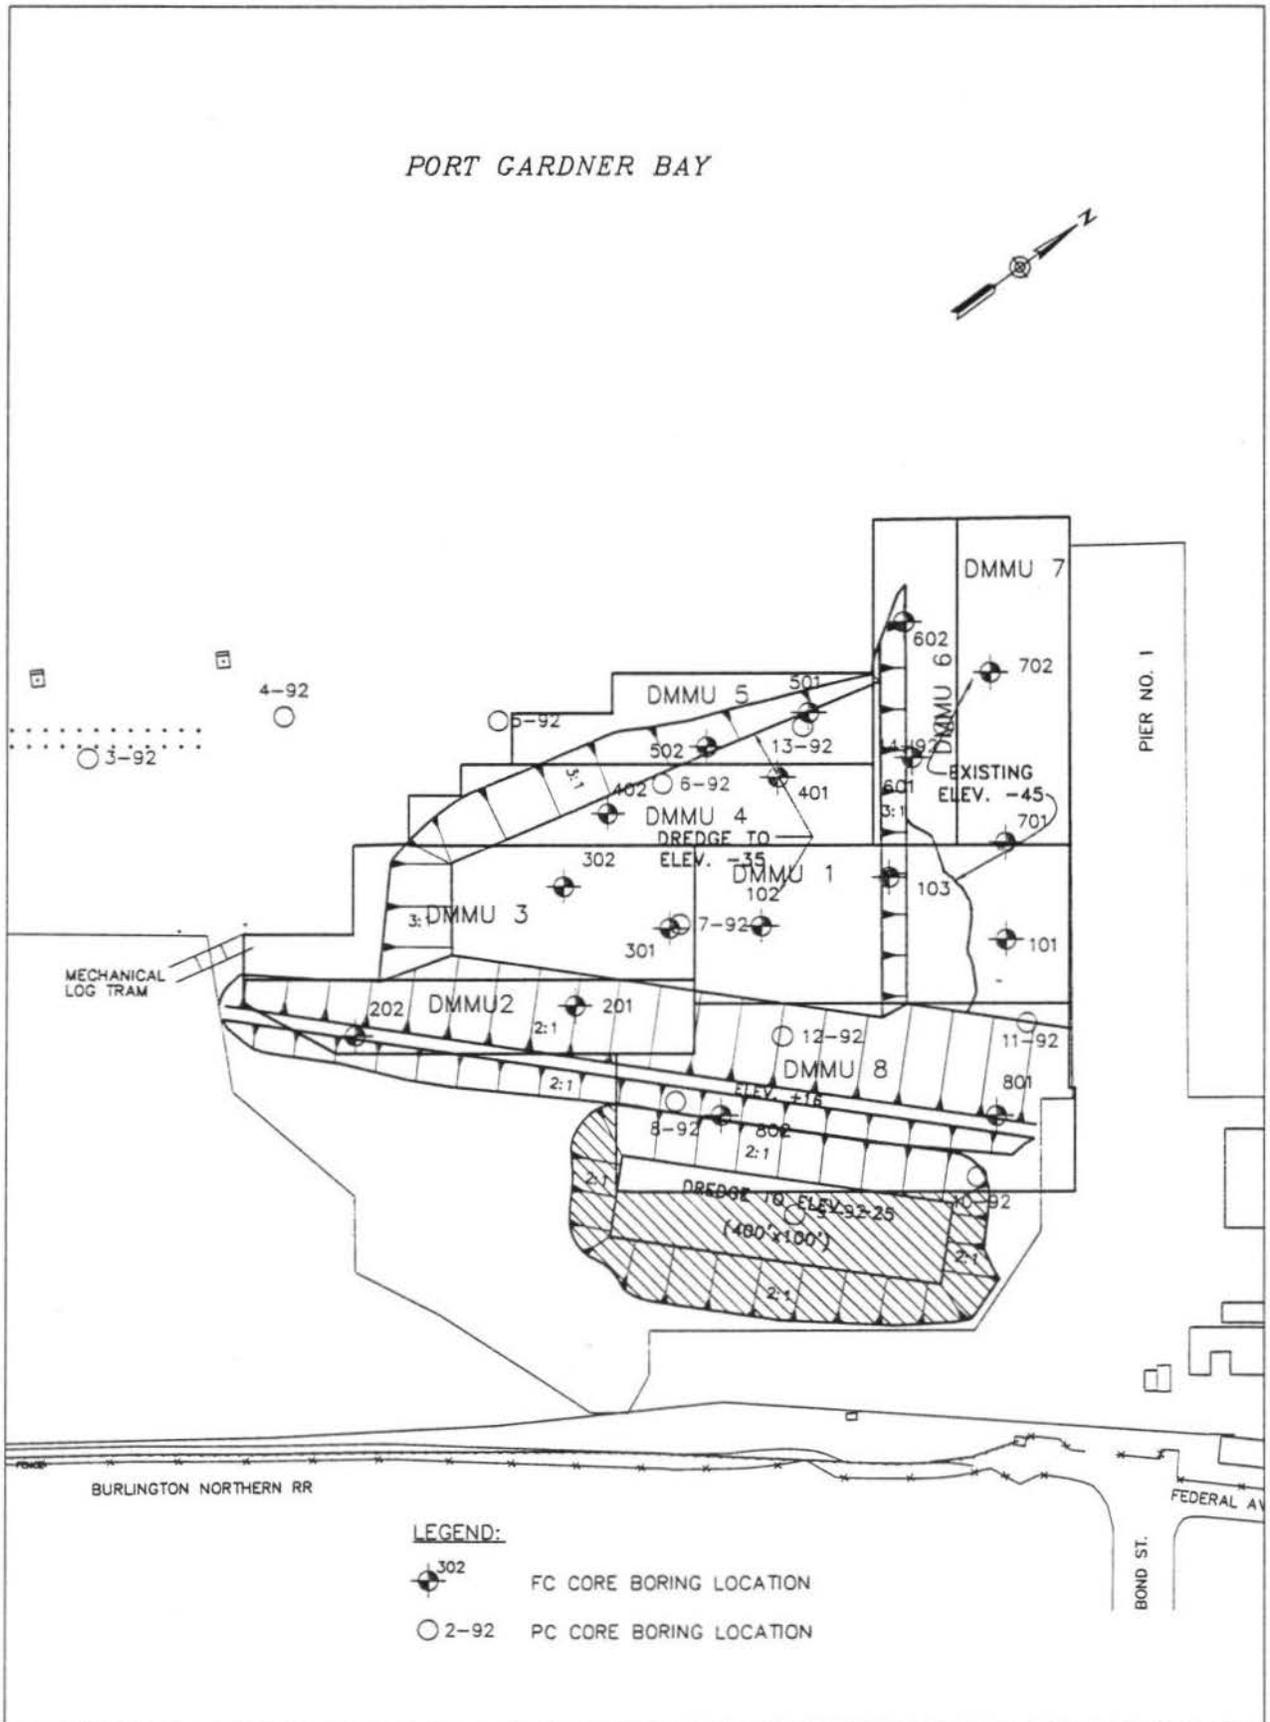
Stage 1 - Marine Terminal Improvements South Waterway Area Dredging Plan View.
